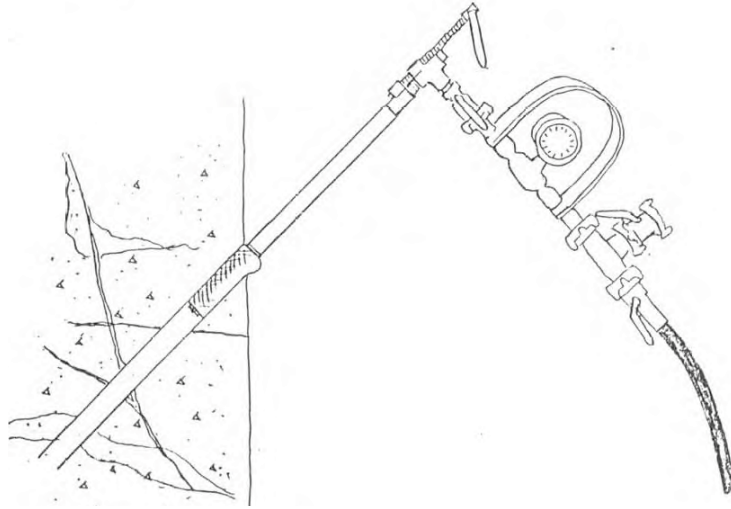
Conceptual drawing of cement grouting of crack
